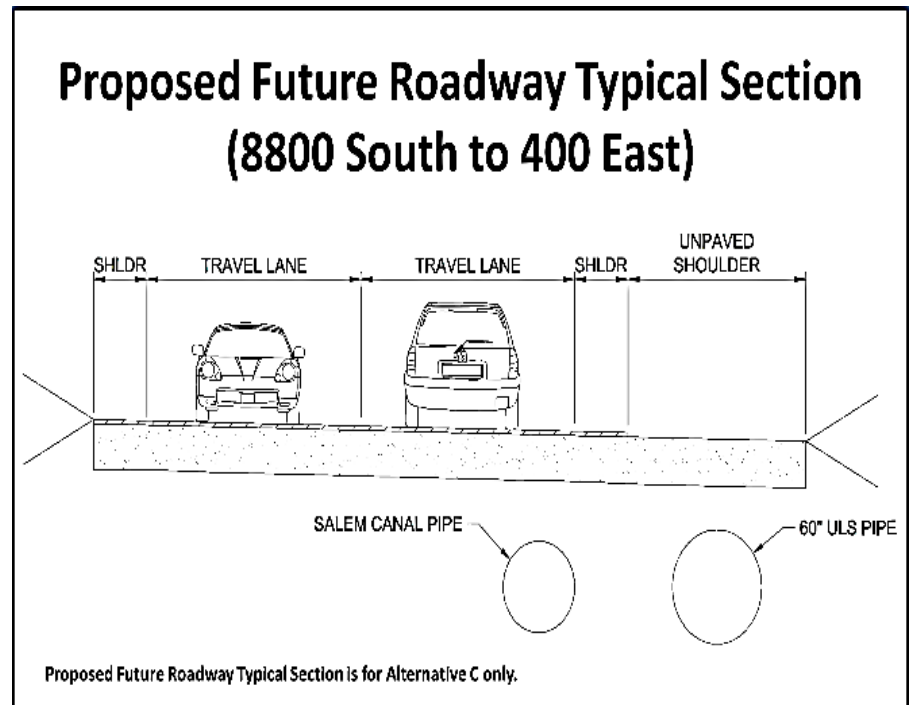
PROPOSED FUTURE ROADWAY TYPICAL SECTION
